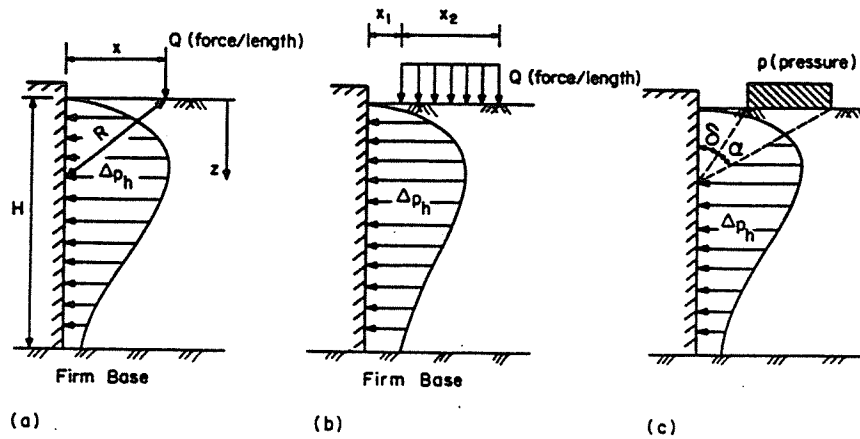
Earth pressures due to line loads and strip loads. (a) Infinitely long line load parallel to wall. (b) Finite line load perpendicular to wall. (c) Uniformly loaded strip parallel to wall.
